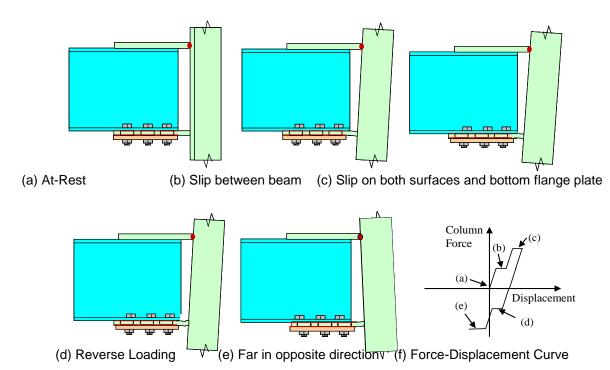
Sliding hinge joint and beam column joint behavior – Courtesy of MacRae et al. (2010)
